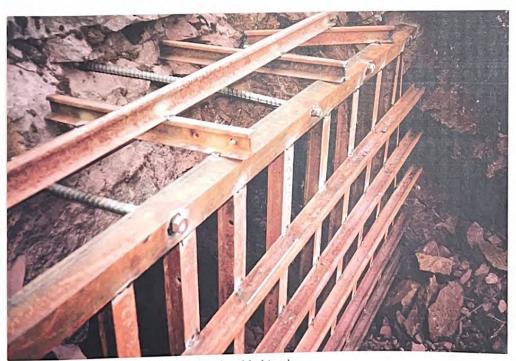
Rock bolting and welding on the sides of the structure.
